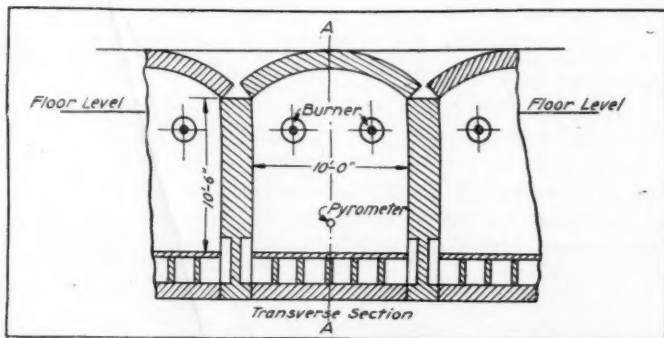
TRANSVERSE SECTION THROUGH ANNEALING FURNACE
